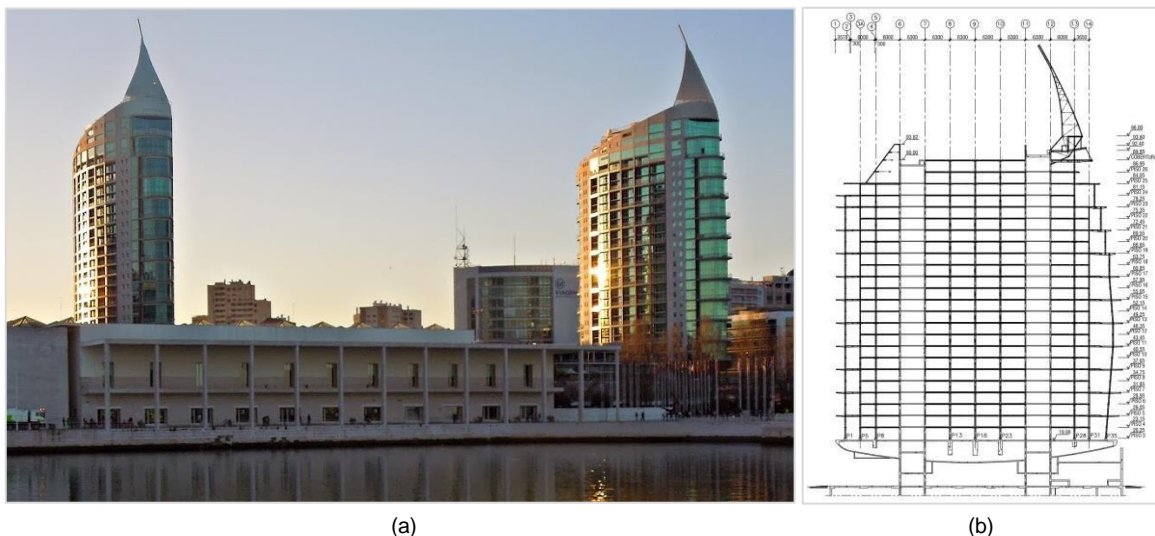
(a) Saint Gabriel and Saint Rafael Towers, Lisbon, Portugal; (b) Structural elevation
